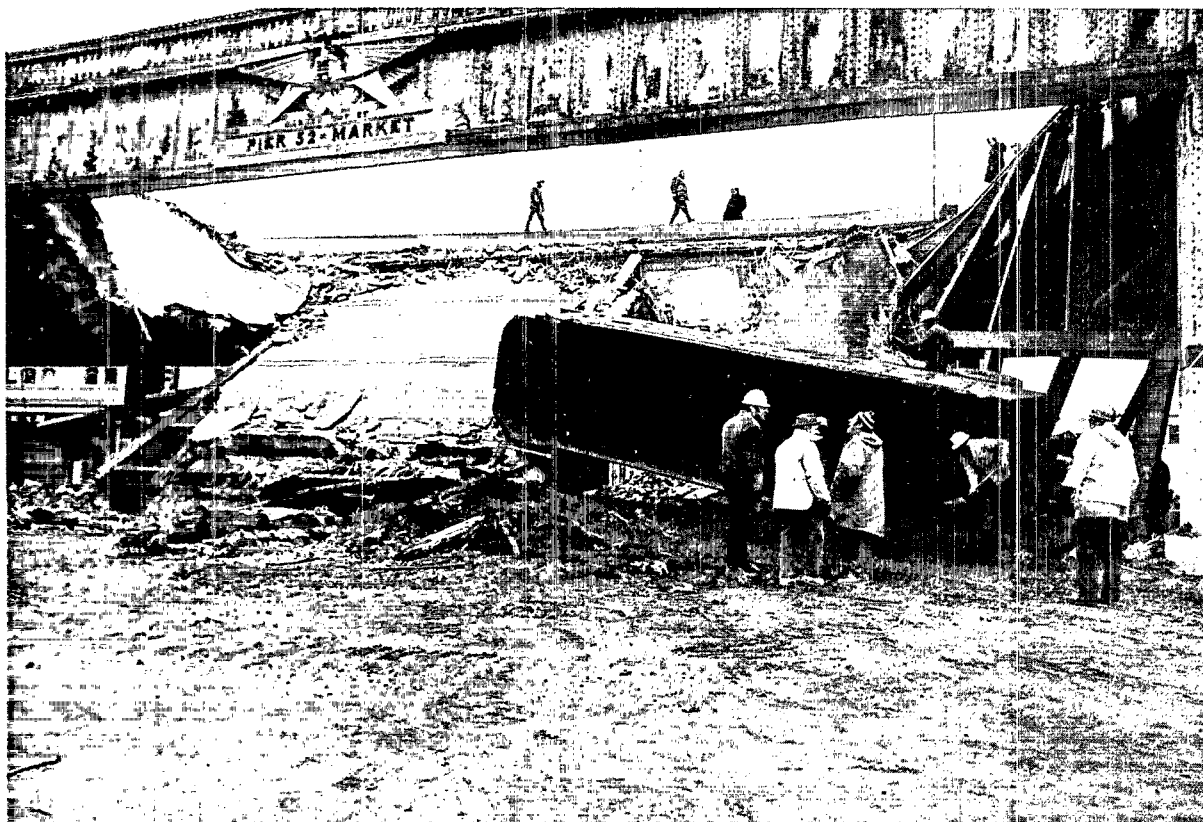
Collapse of West Side Highway at Ganesvoort Street on 12/15/73
